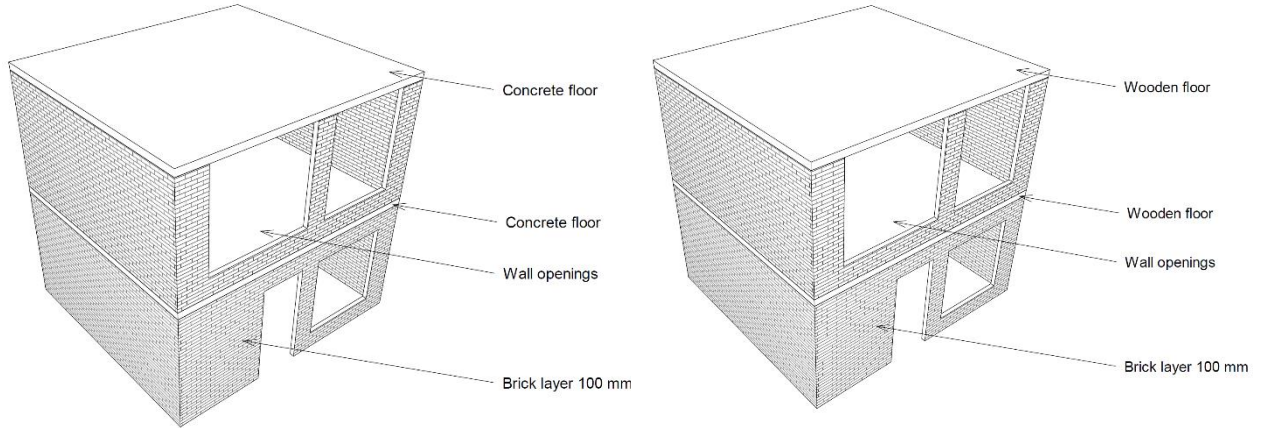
3D MODELS CONCRETE FLOOR, TIMBER FLOOR FROM LEFT TO RIGHT
